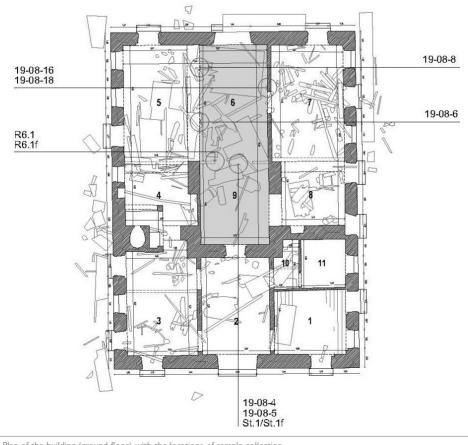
Plan of the building (ground floor) with the locations of sample collection.
